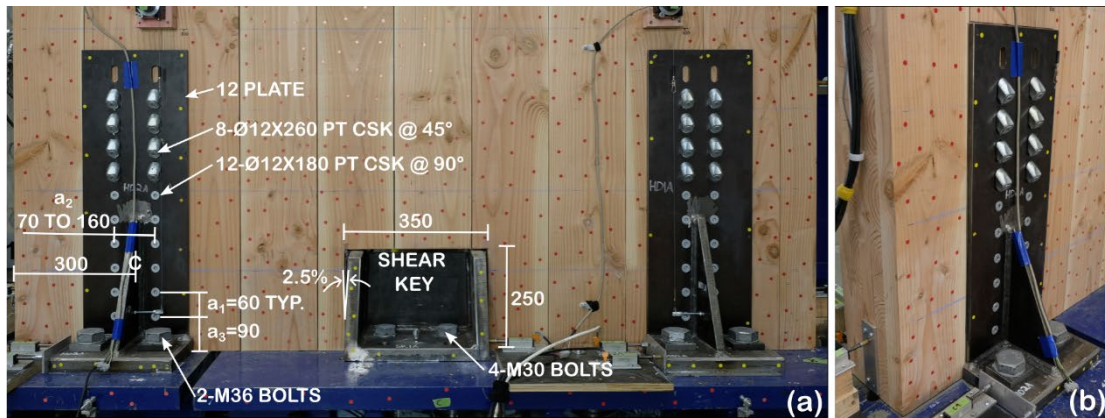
Wall pier base connections: (a) front elevation and (b) isometric.
